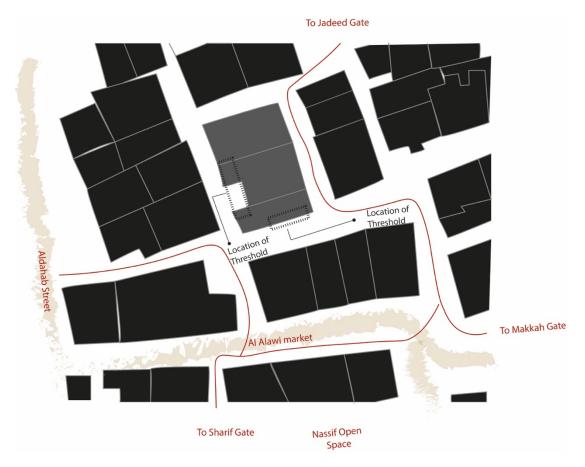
Site plan showing Jamjoom house and the surrounding houses. Source: Author.
